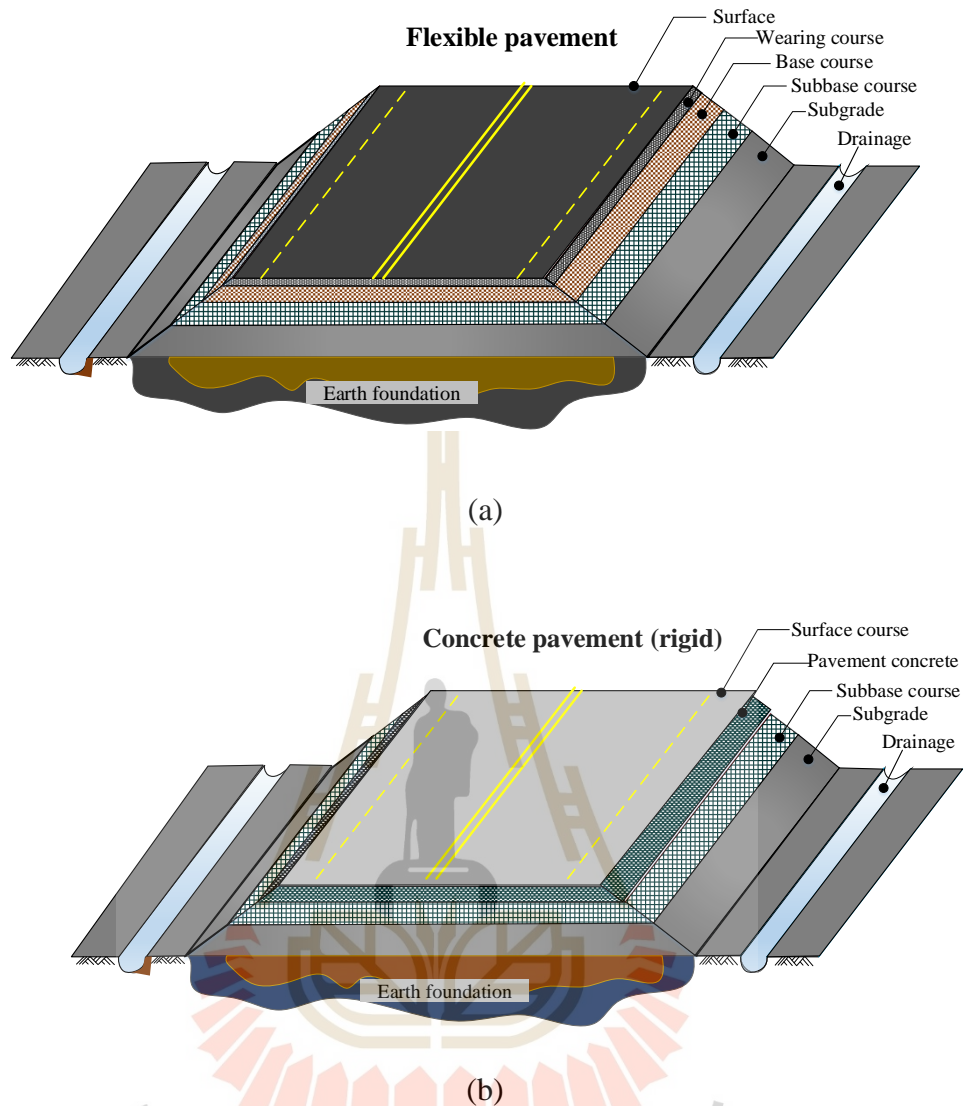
Typical pavement construction layers (a) flexible pavement, and (b) concrete pavement (rigid) (not to scale) (Sherwood, 2001).
